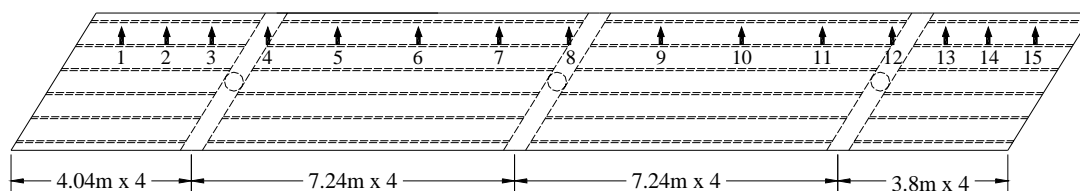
Deployment of capacitive accelerometers shown on plan view of bridge superstructure
